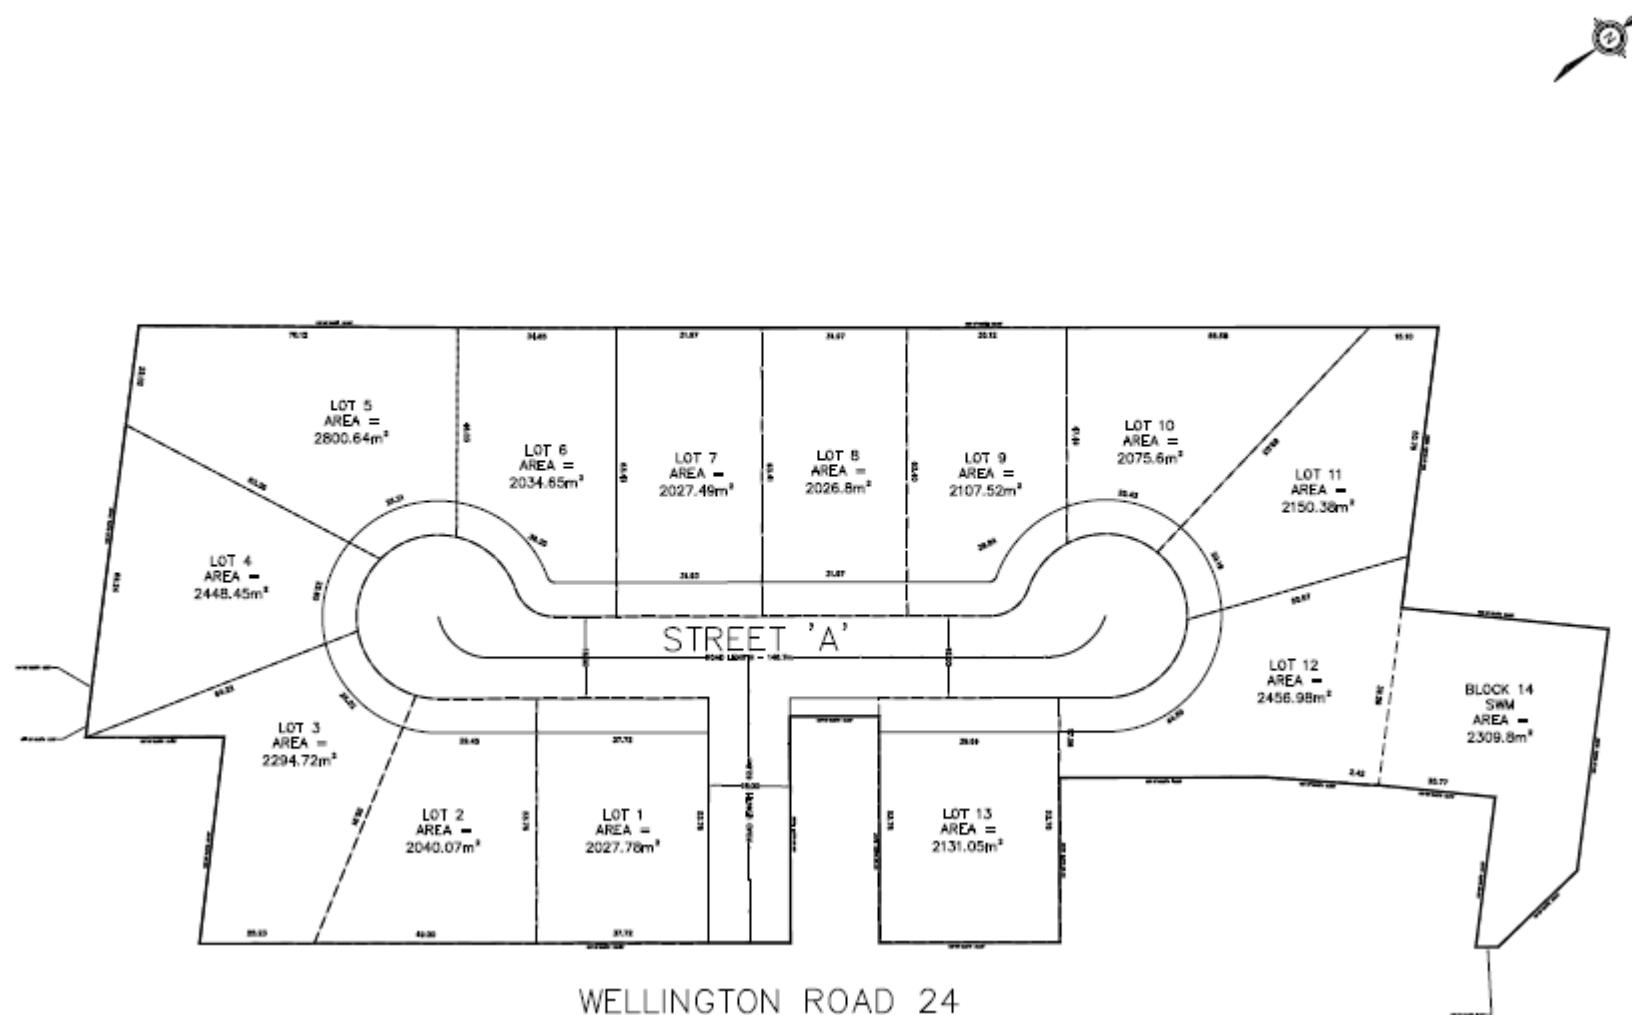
Site Plan – Scenario 1 Configuration
